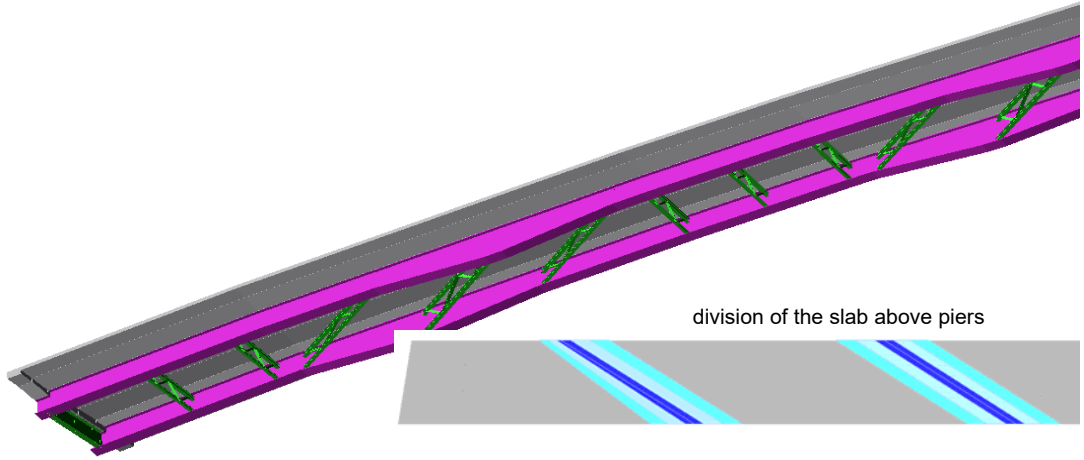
Left half of FEM model of the superstructure and highlighted division of the slab above piers
